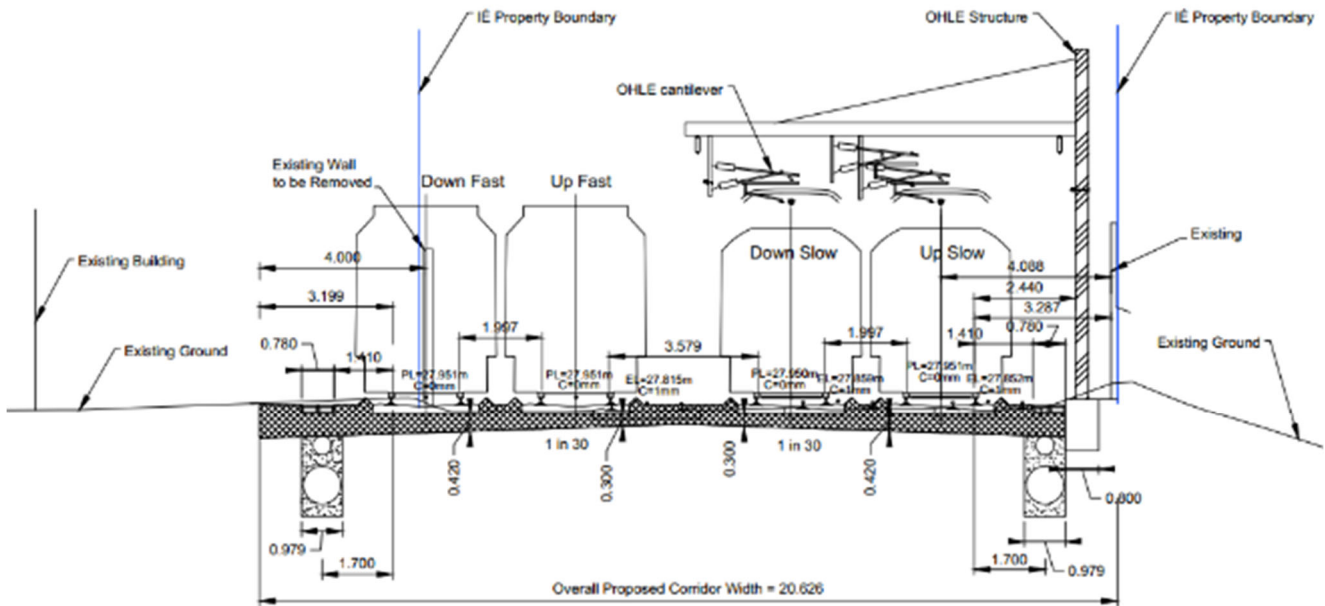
Network 2 Cross Section from ch.10+650 to 10+780
